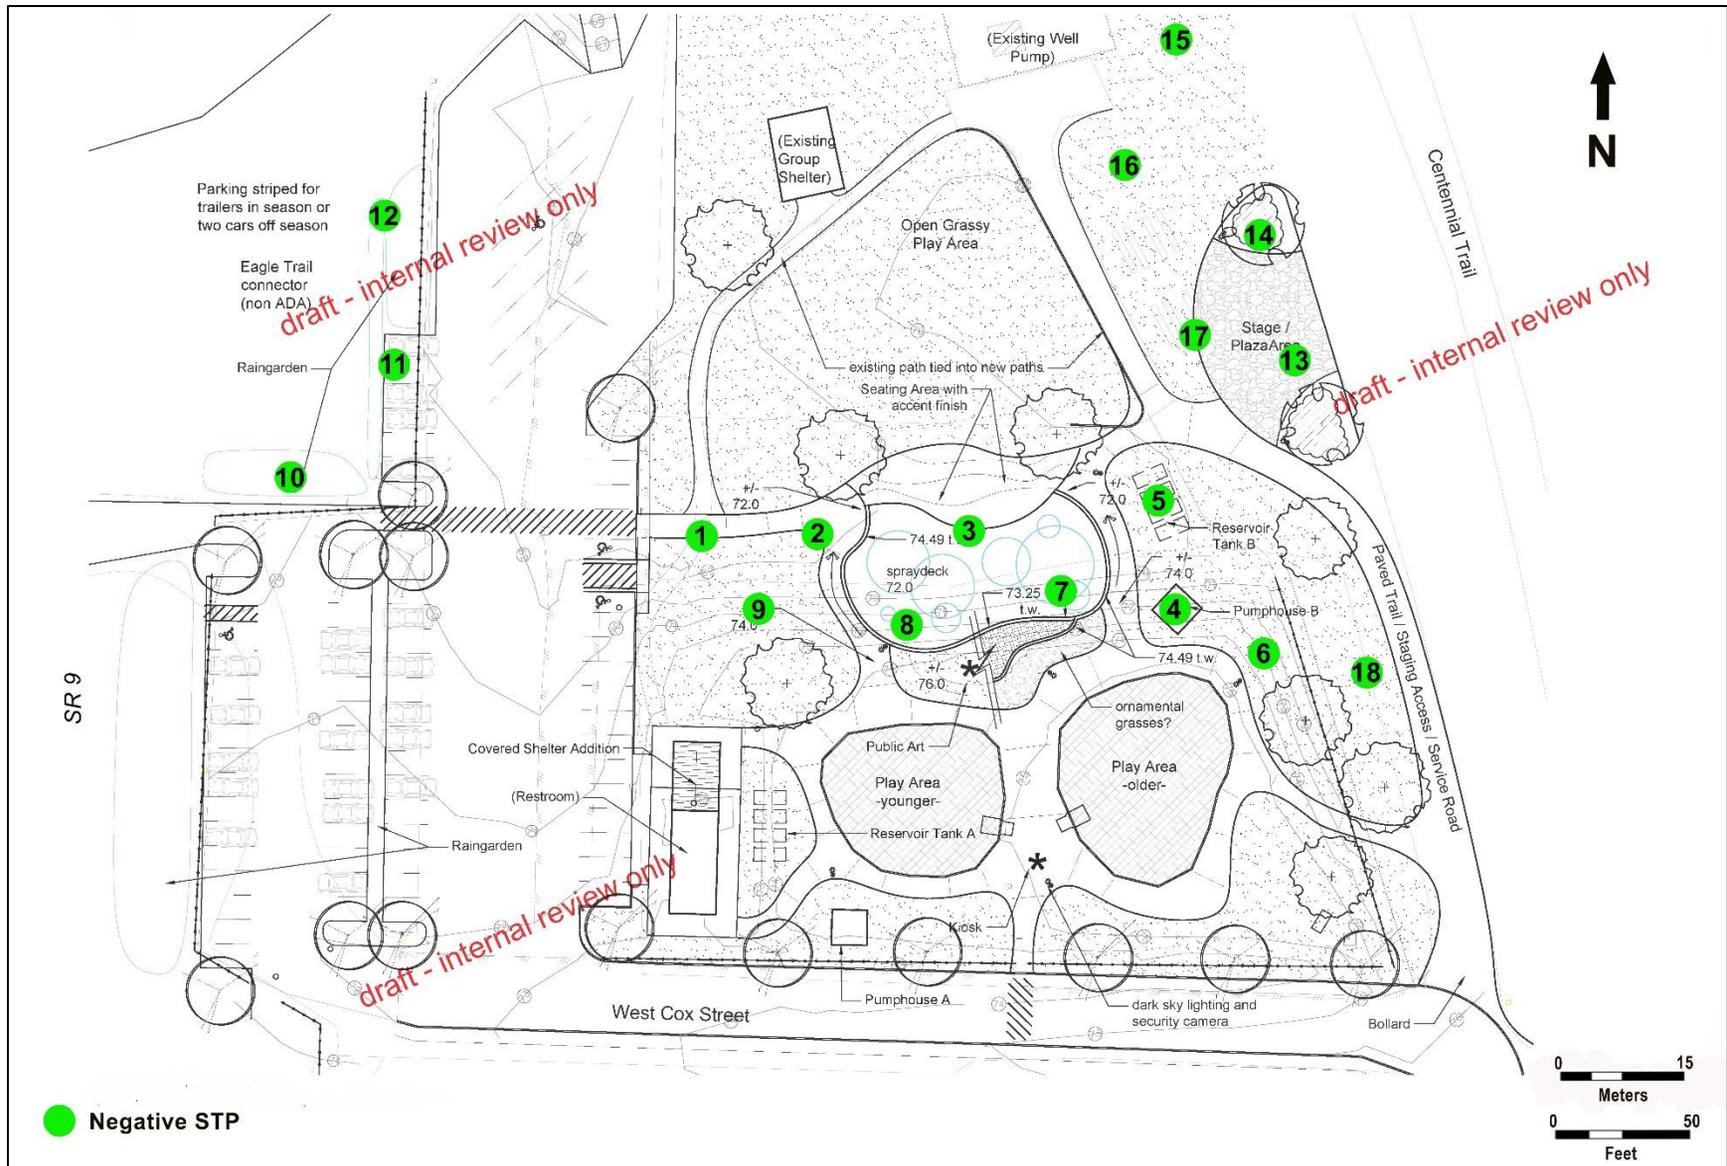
Haller Park Splash Pad Project Preliminary Site Plan showing STP locations.
